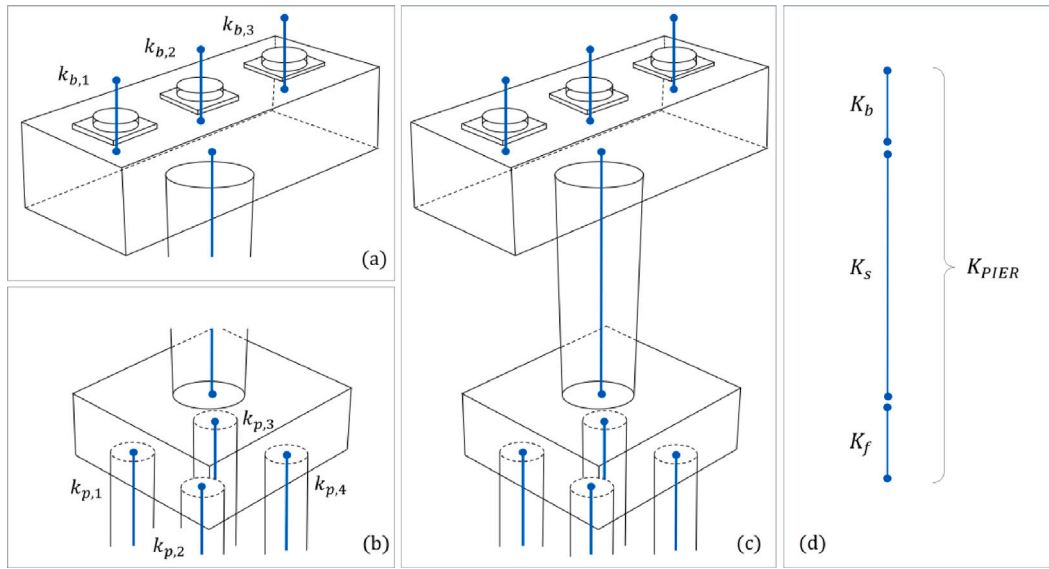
Example 1. Pier's structural element layout comprising its individual components. (a) Bearing support system. The support system of the pier consists of the bearings devices working in parallel with each other; (b) foundation system. The foundation system of the pier consists of the foundation piles working in parallel with each other; (c) the structural components of the pier: bearing support system, shaft and foundation system work in series with each other; (d) schematization of the pier's components working.
